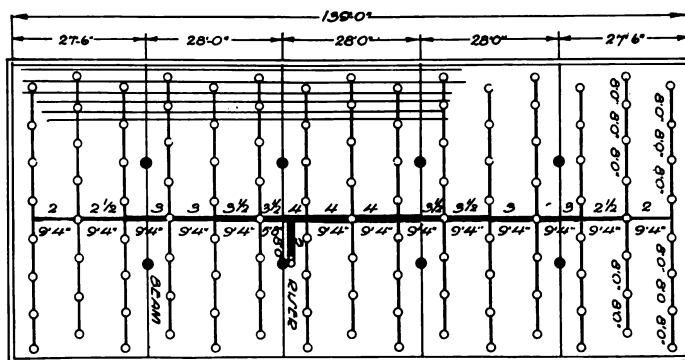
Sprinklers under Joist Construction. Heavy Lines are Feed Mains and Light Lines are Branch Lines or "Stringers"
